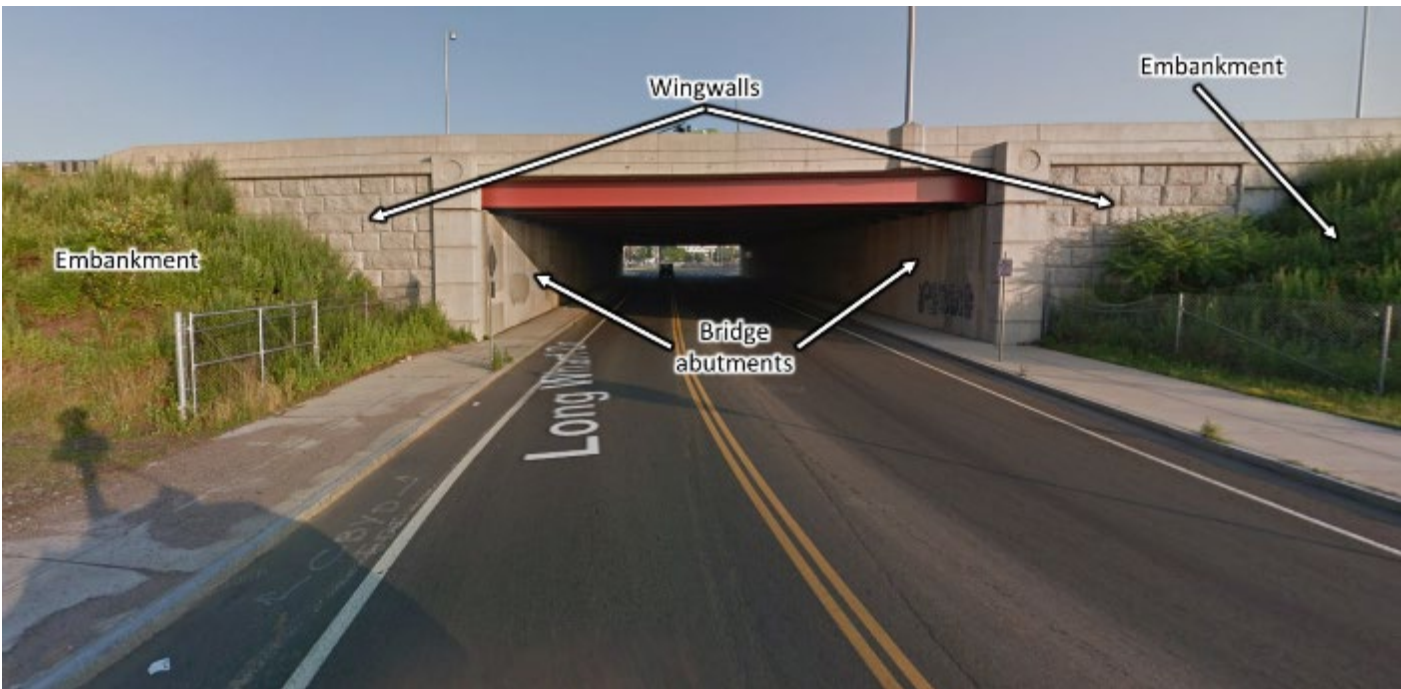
Long Wharf Drive Bridge under I-95 embankment
